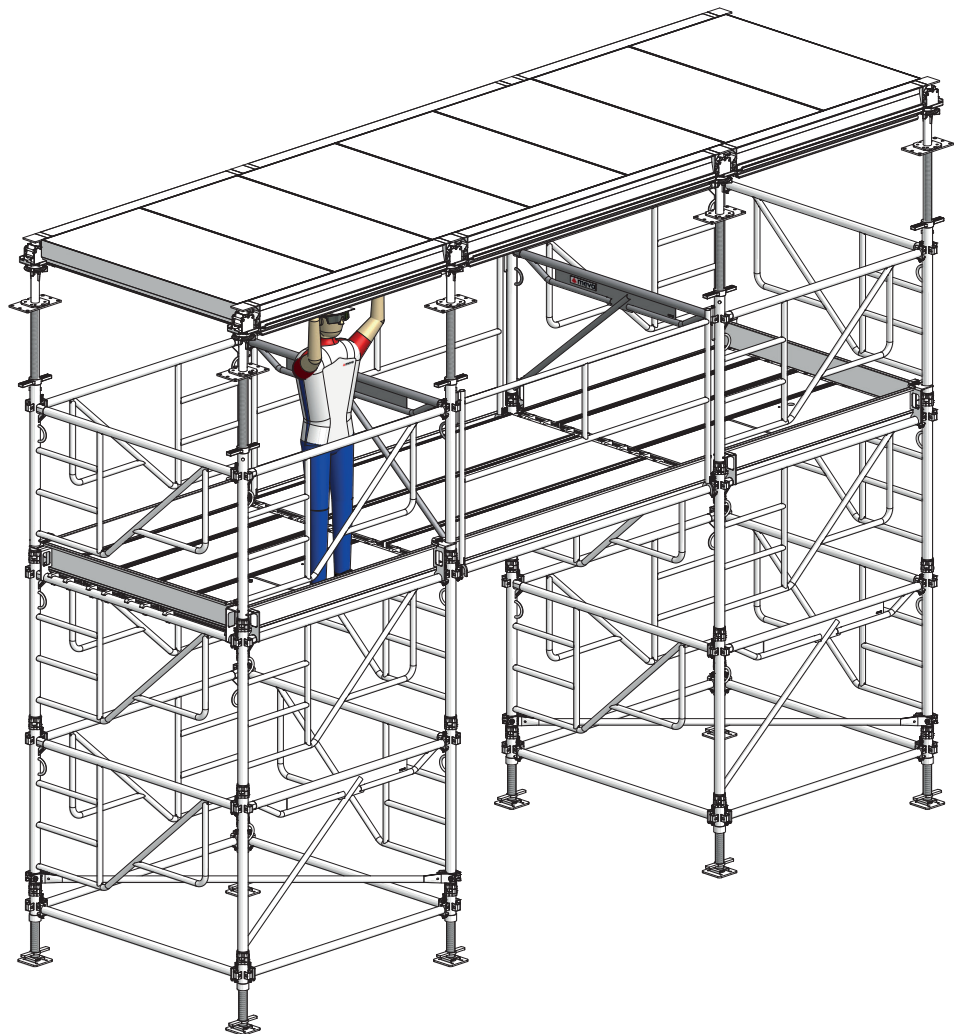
Shoring towers MT 60 supporting the MevaDec slab formwork
